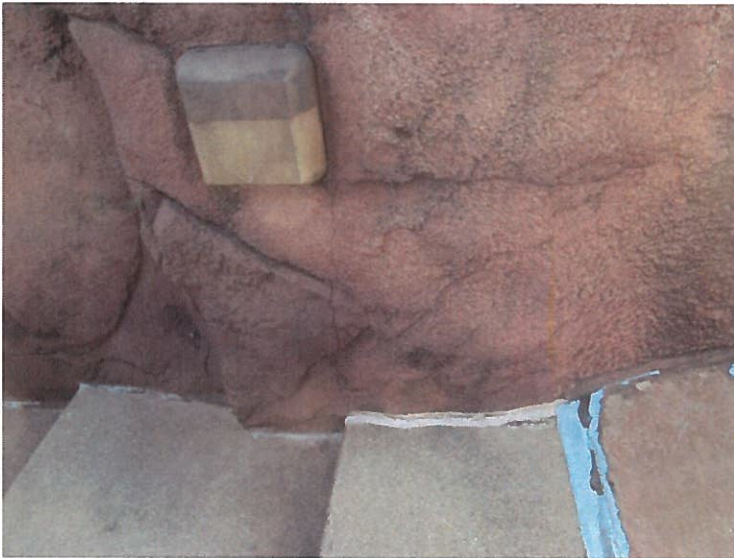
Interface of concrete stair and base of rock work, crack in rock work at light fixture, and expansion joint at top of stairs and split slab system at landing.
